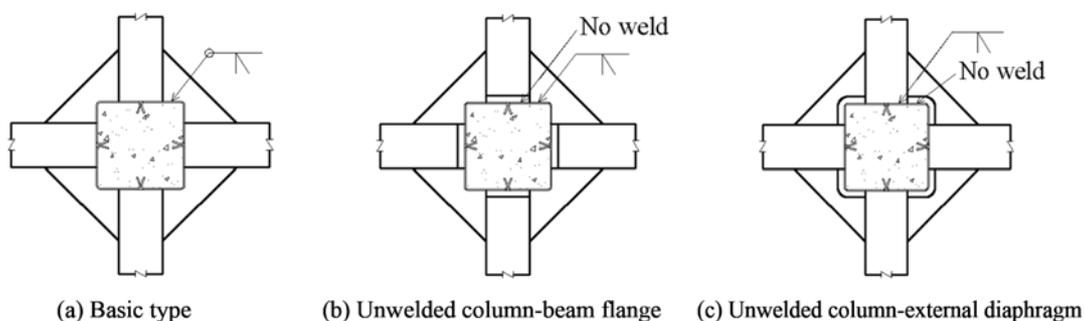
Built-up square CFT column welded to external diaphragm connections
